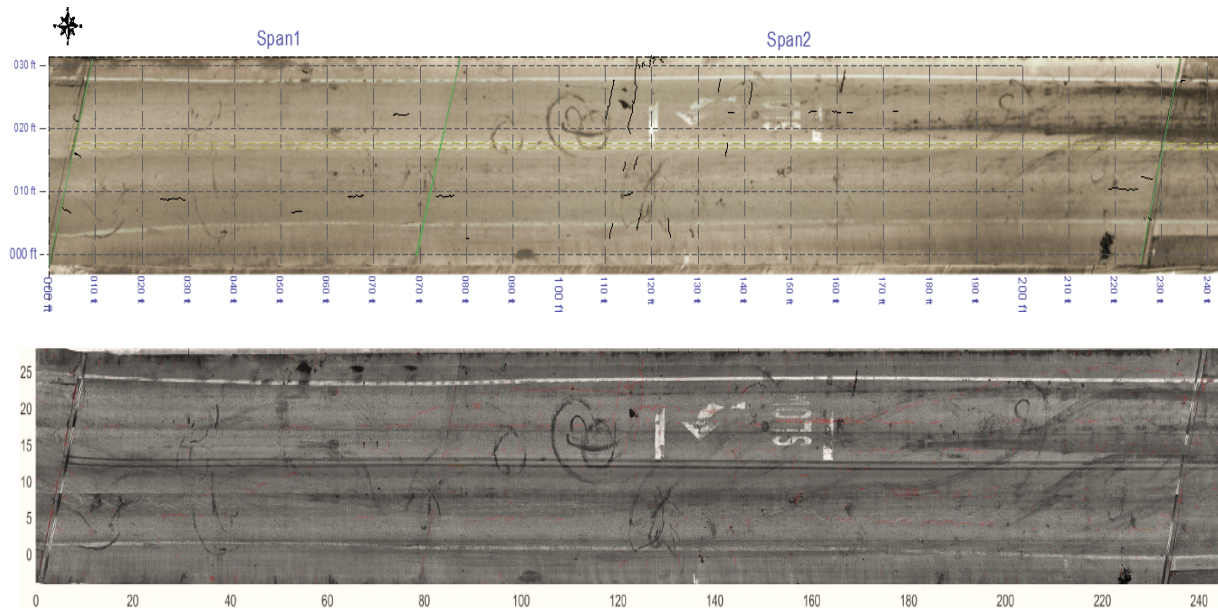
Existing Cracks of Bridge Deck No. 22266-Overall View Image
